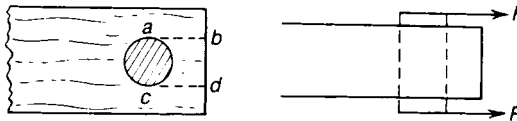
Shearing stresses in a rivet; shearing forces  $F$  is transmitted over the face  $ab$  of the rivet.
